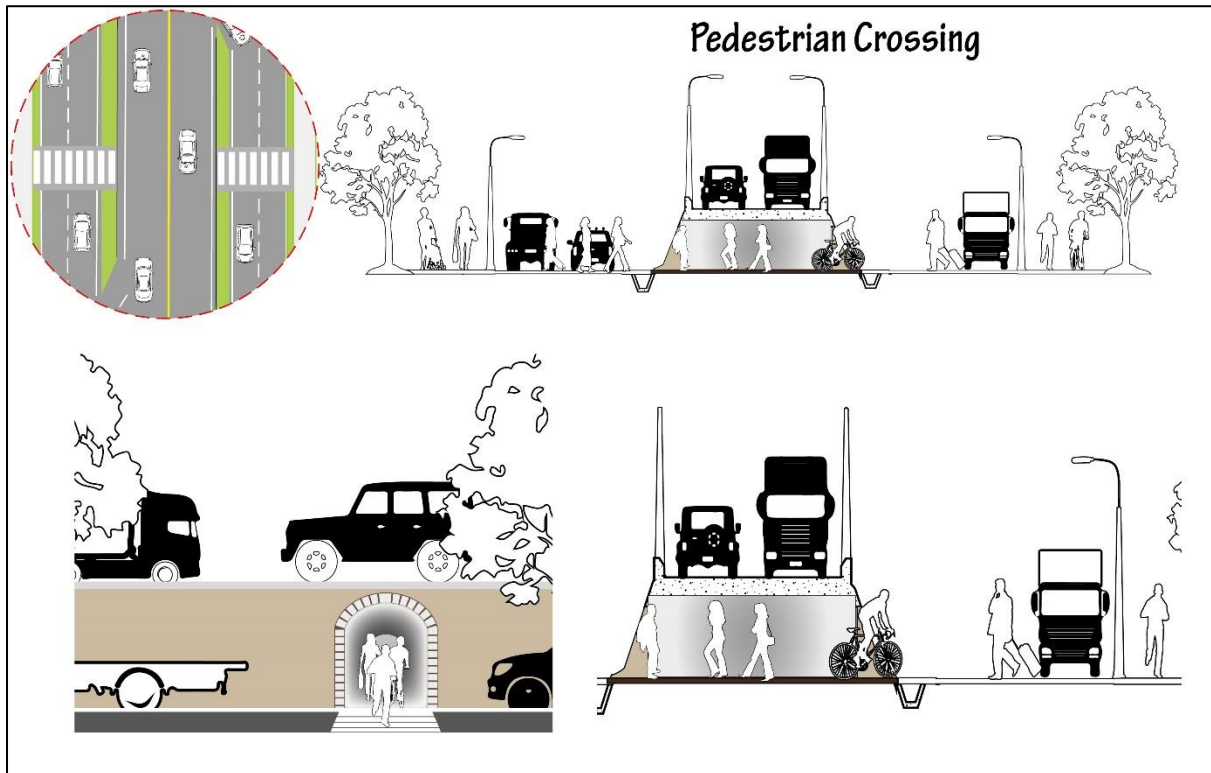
proposed pedestrian crossing tunnels at grade with the service roads
